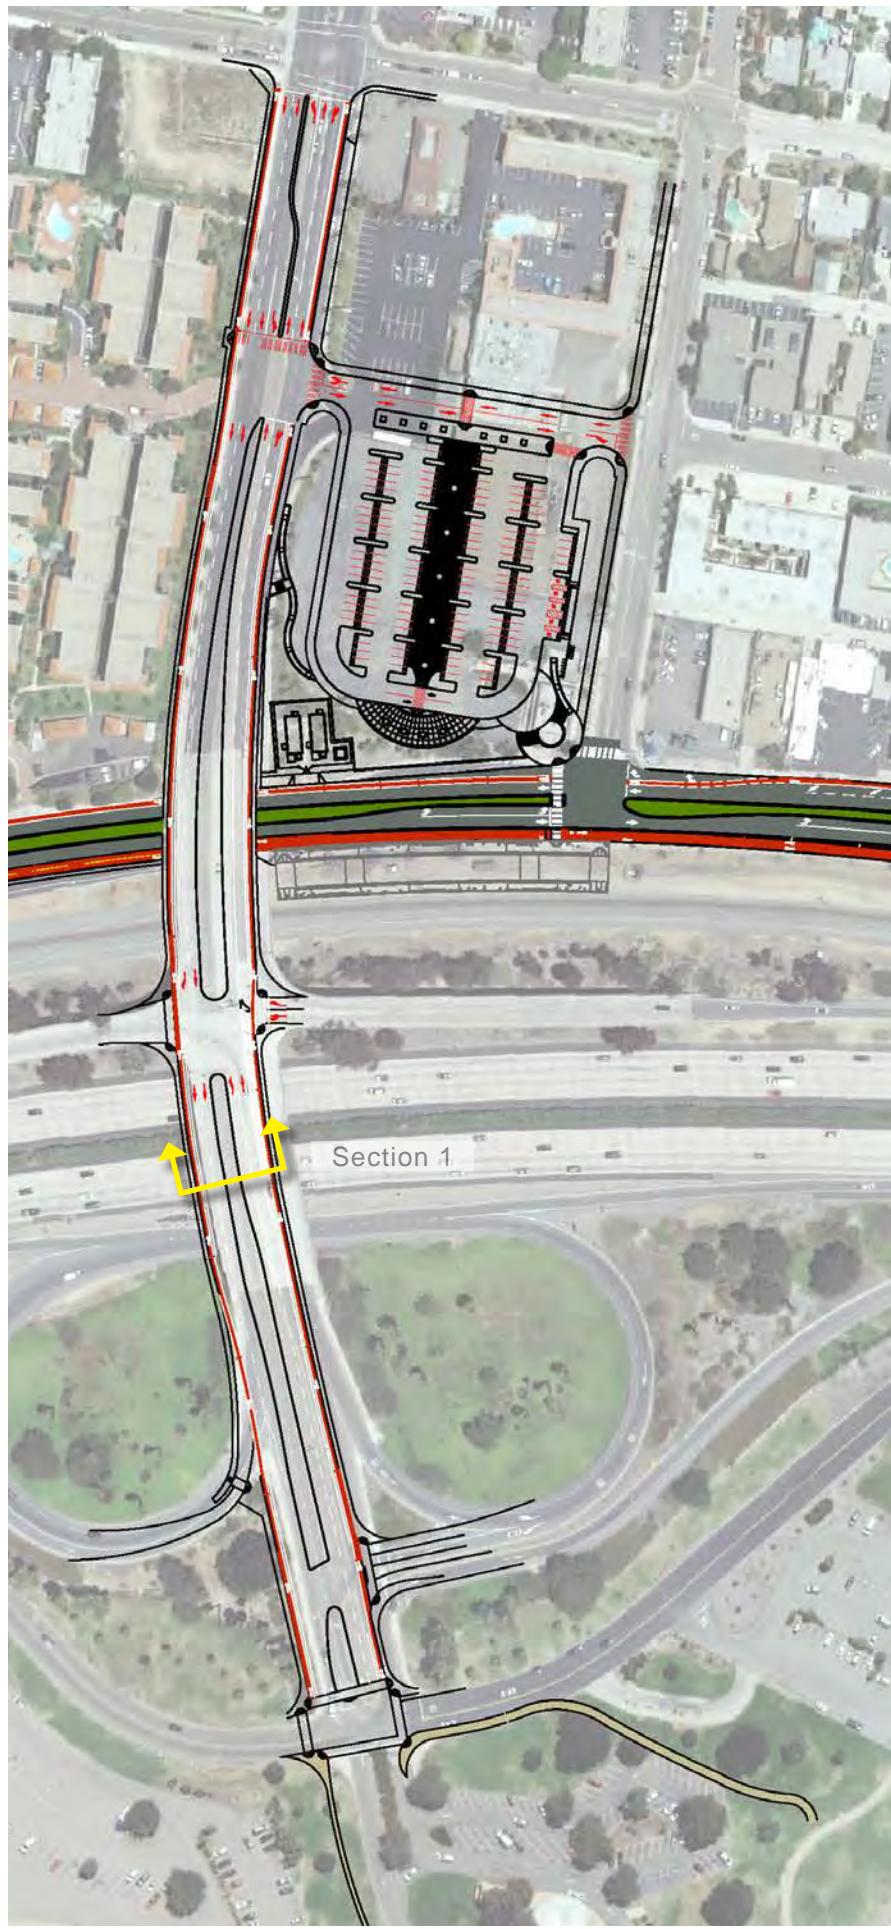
Plan View of Clairemont Bridge Crossing Improvements
